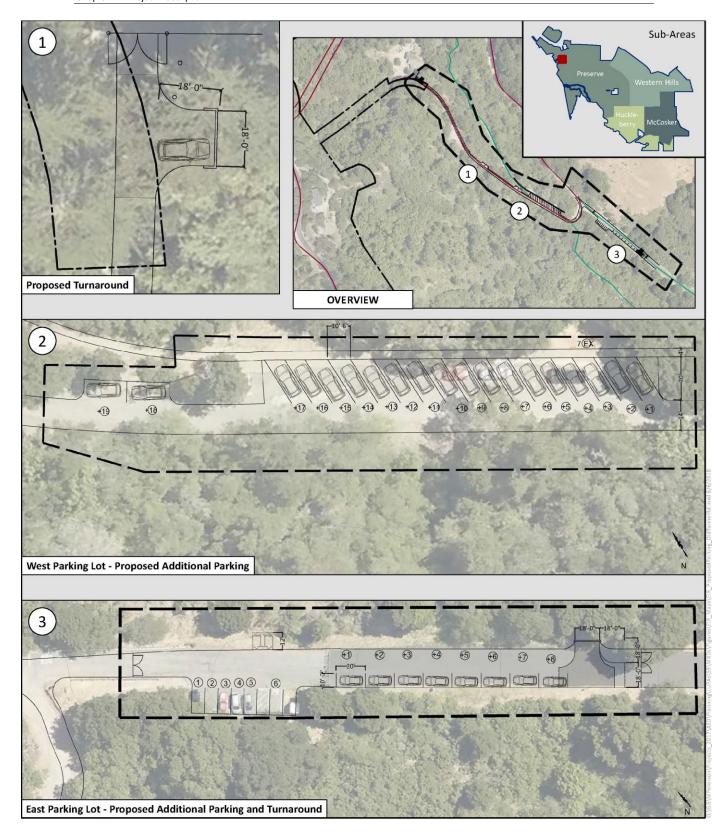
PROPOSED PARKING LAYOUT, OLD TUNNEL ROAD. PRESERVE SUB-AREA
